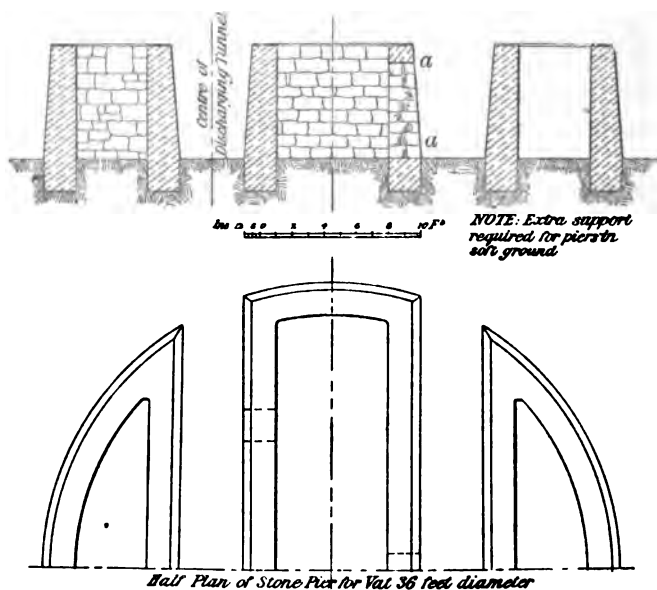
Pier for Single-tier Vats; Section and Half Plan.
